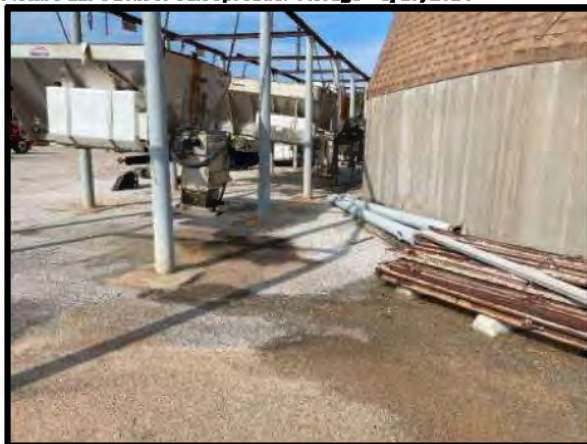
Cracks on Exterior of Salt Storage Building – 8/27/2024
